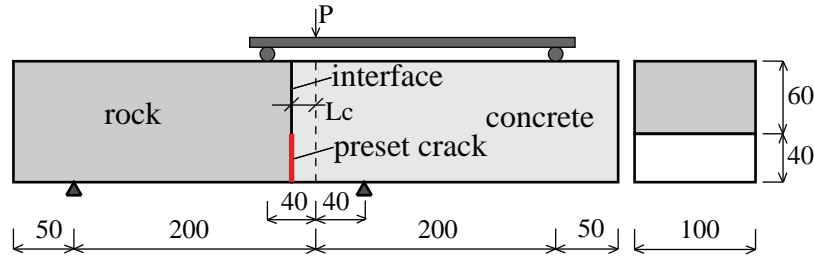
Four-point shear loading of concrete-rock specimens (unit: mm).
